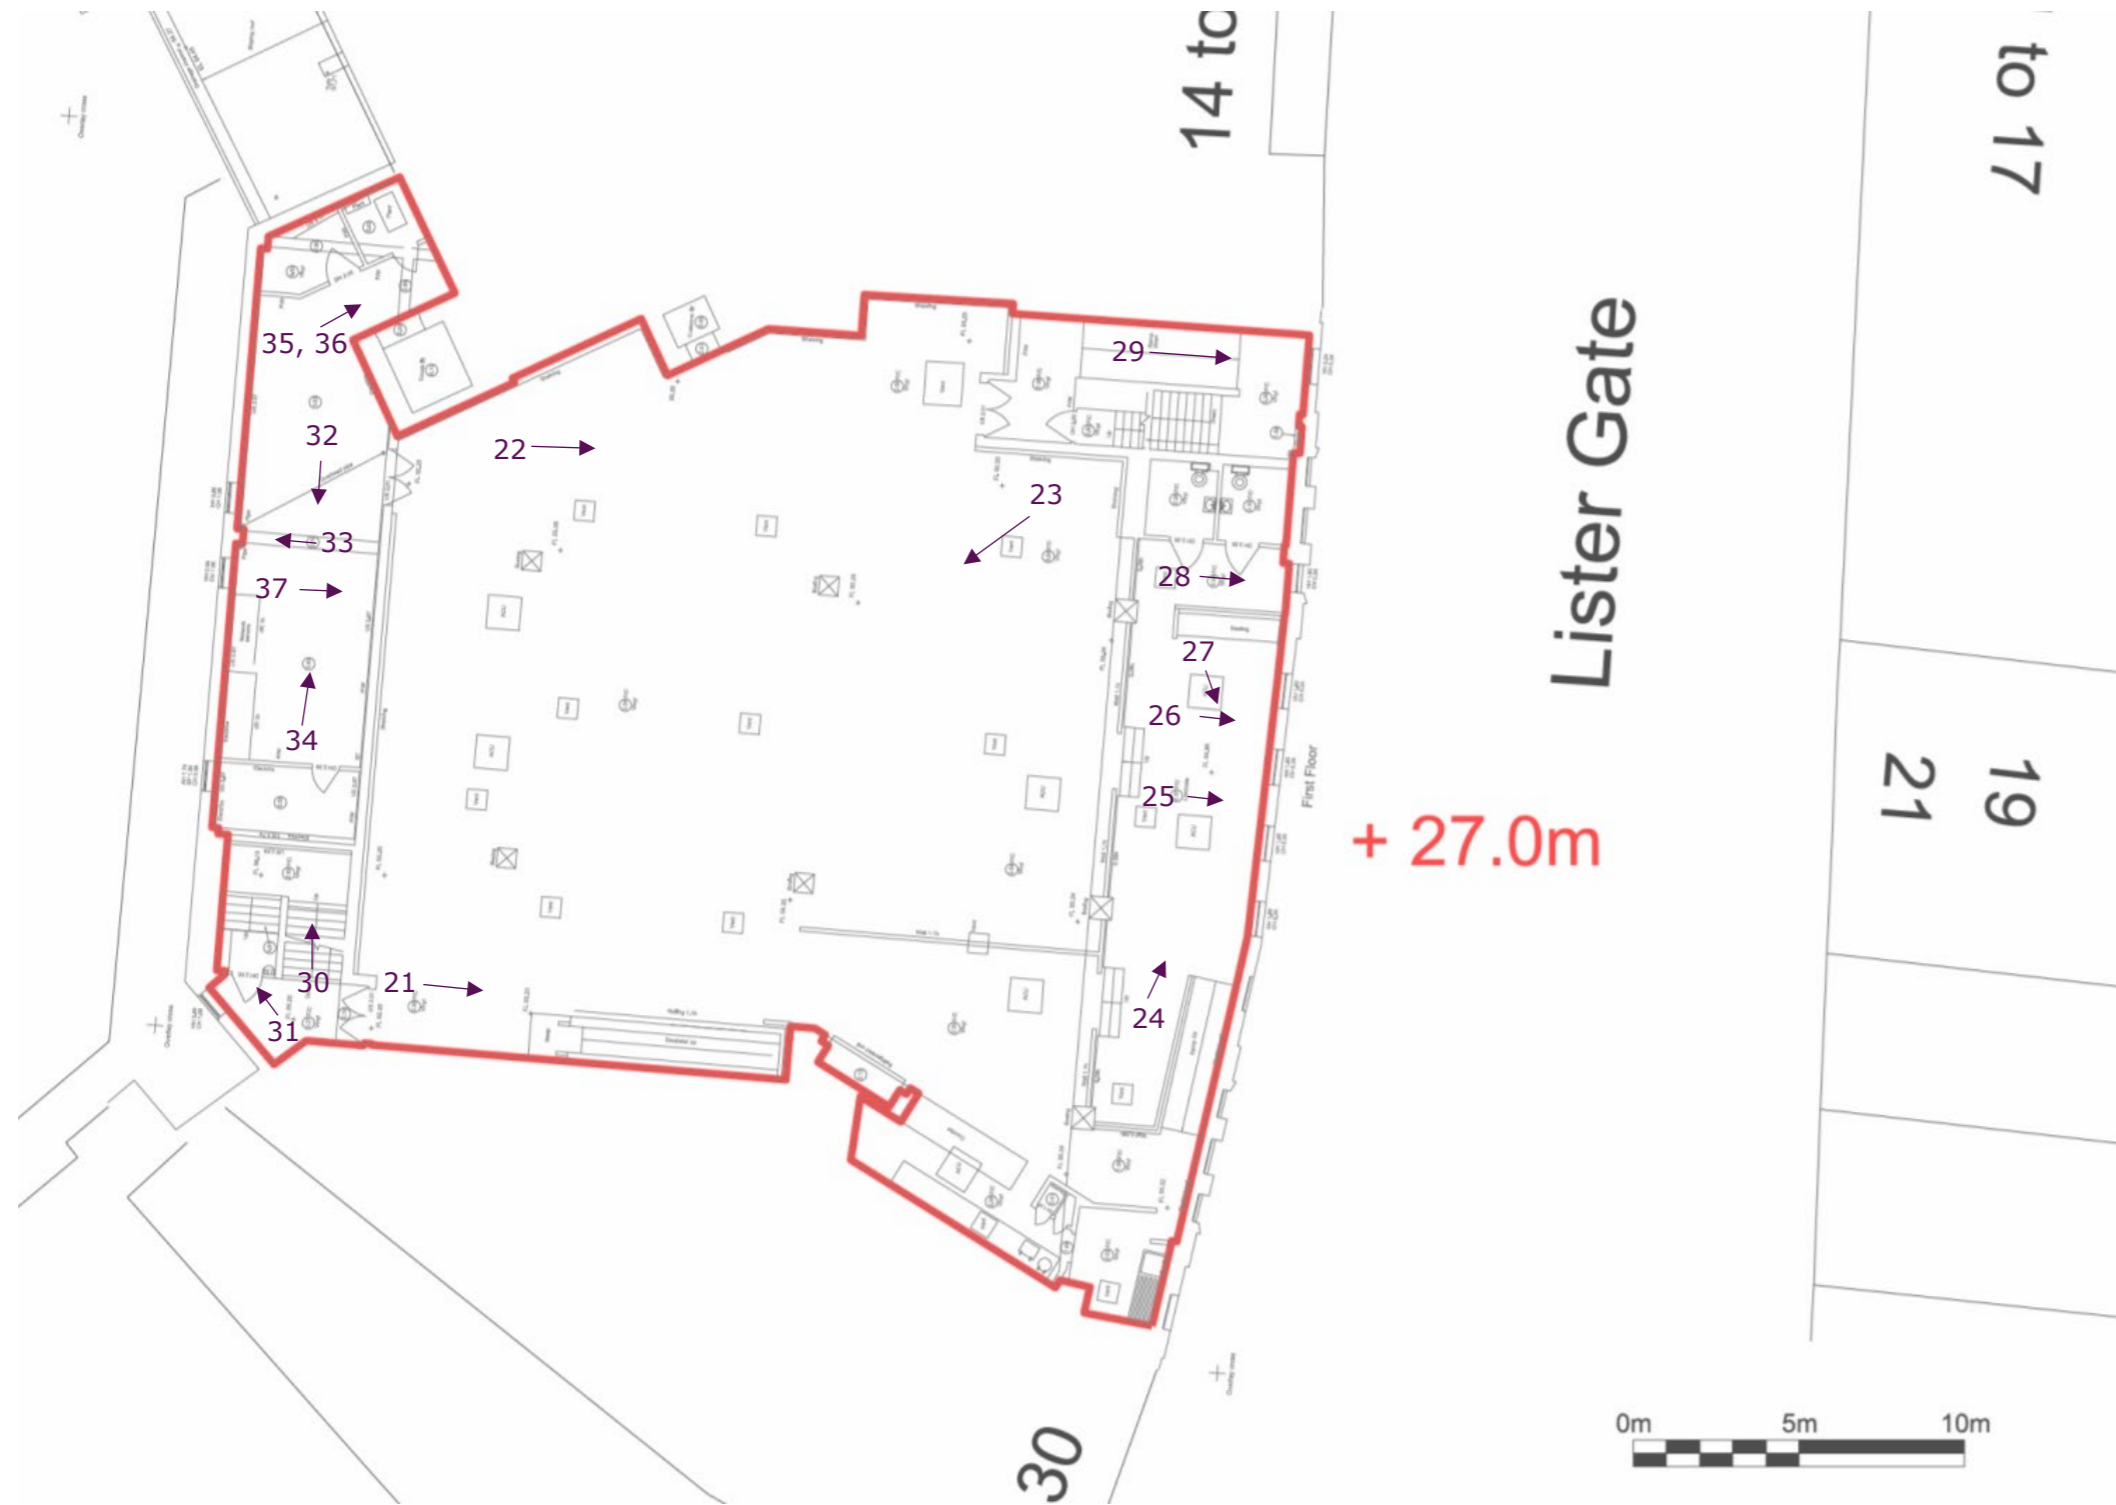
First floor plan (by B3 Architects, provided by client) showing locations of photographs
